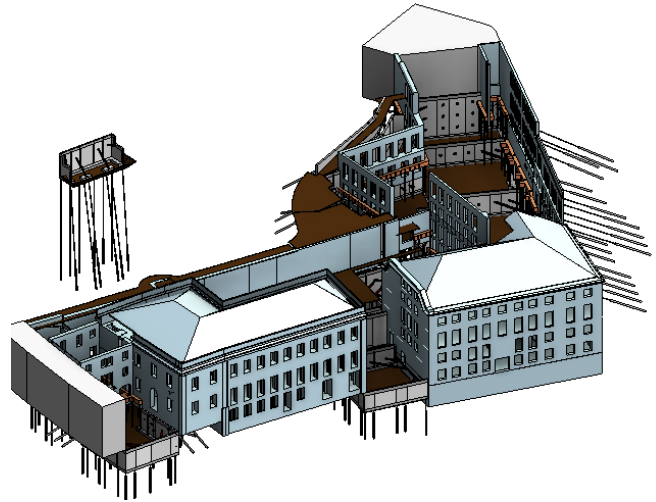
3D view of solutions for excavation and peripheral earth retaining.
